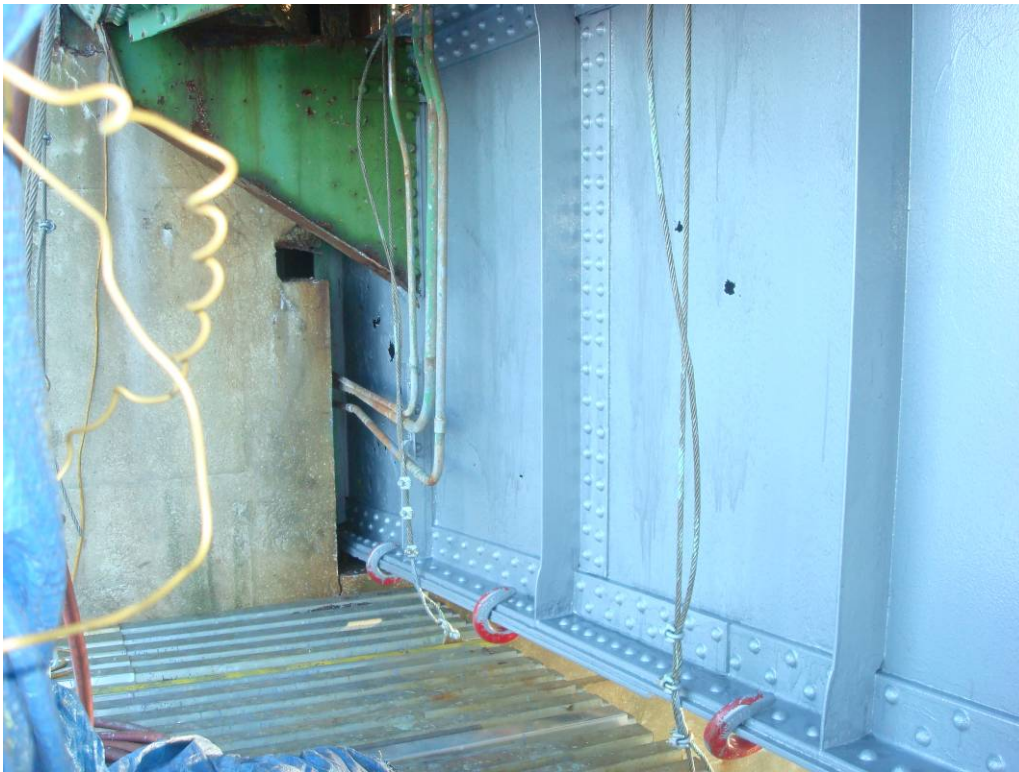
The East girder elevation looking at FB4 of the South leaf primed with Epoxy Mastic Aluminum.
